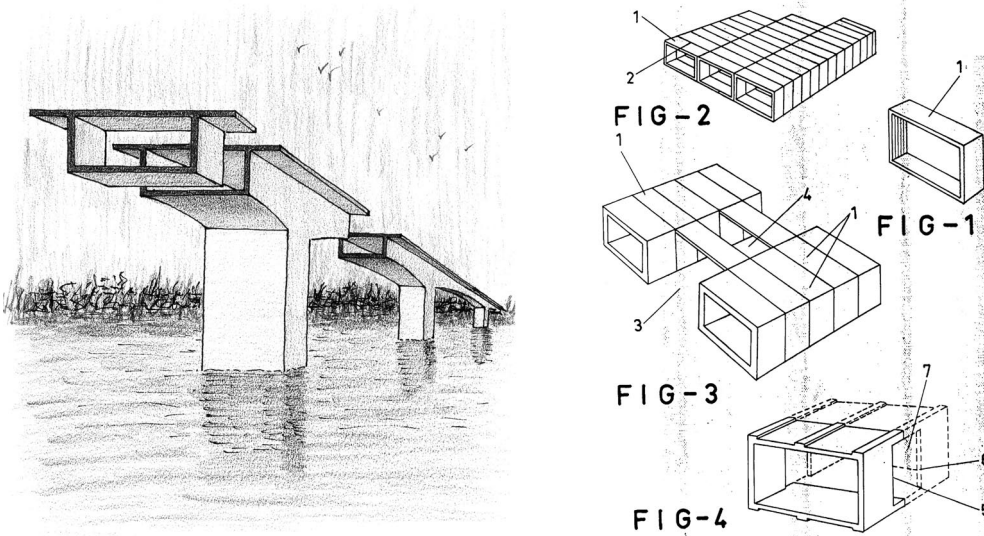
left. Building bridges with precast concrete segments. Originals from Foundation March Archives. Designed by: Vicente Blasco, 2016. (Private Archives of Vicente Blasco.)
